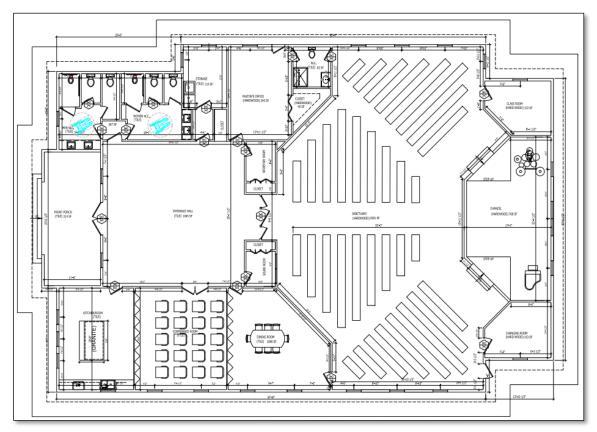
Floorplan of the proposed religious assembly Source: Applicant
